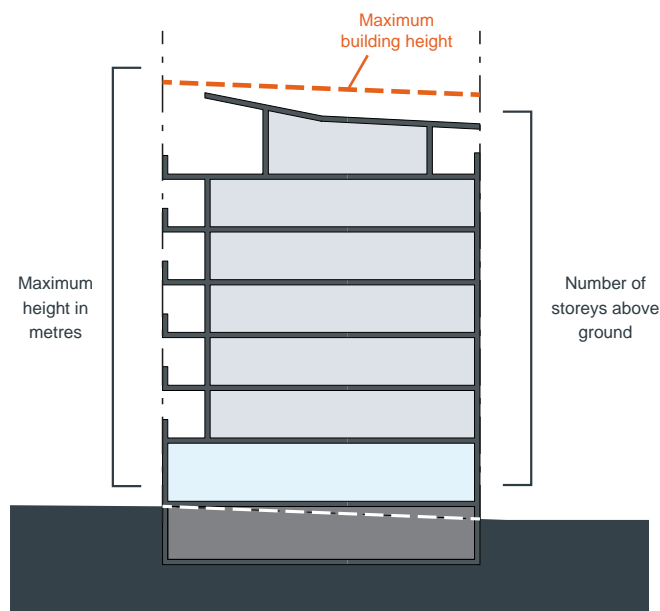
C.1 The total height of a building informs the number of storeys possible in a development. Floor to floor heights vary depending on the use e.g. shops and offices are typically higher than residential apartments
